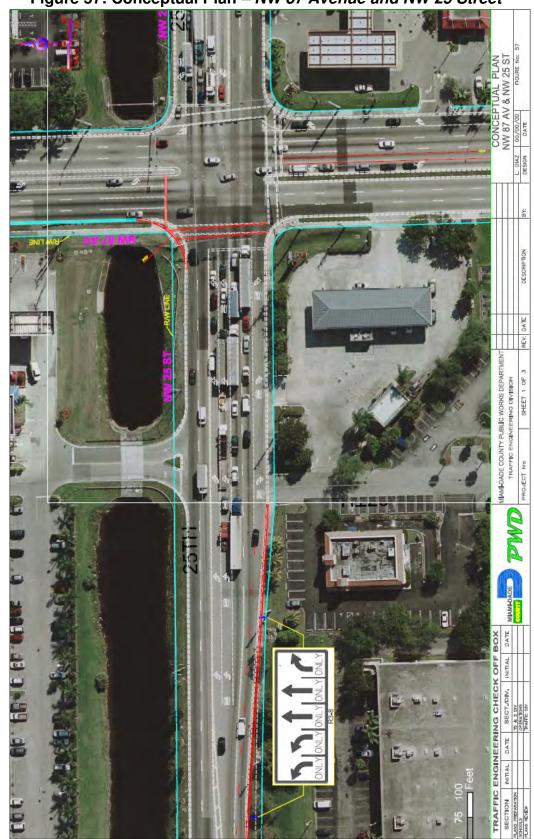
Conceptual Plan – NW 87 Avenue and NW 25 Street
